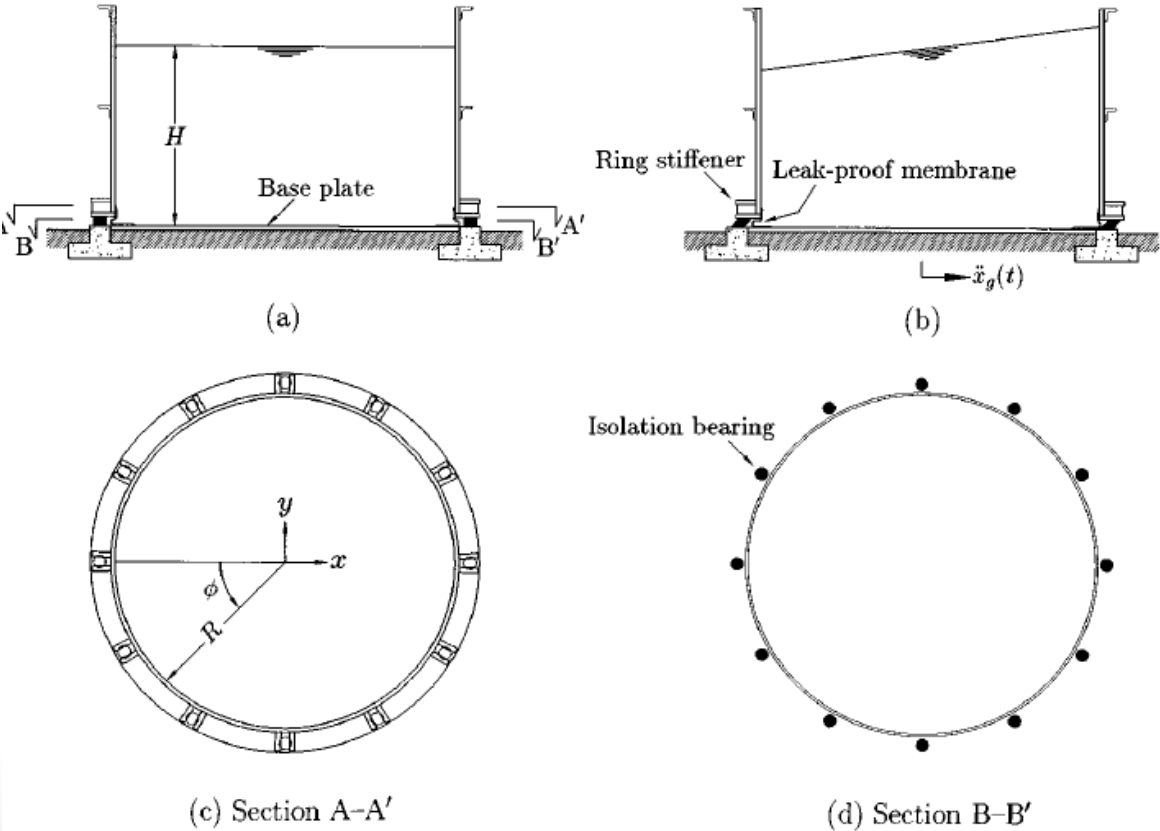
Liquid-Storage Tank Anchored with Steel Hysteretic Dampers
